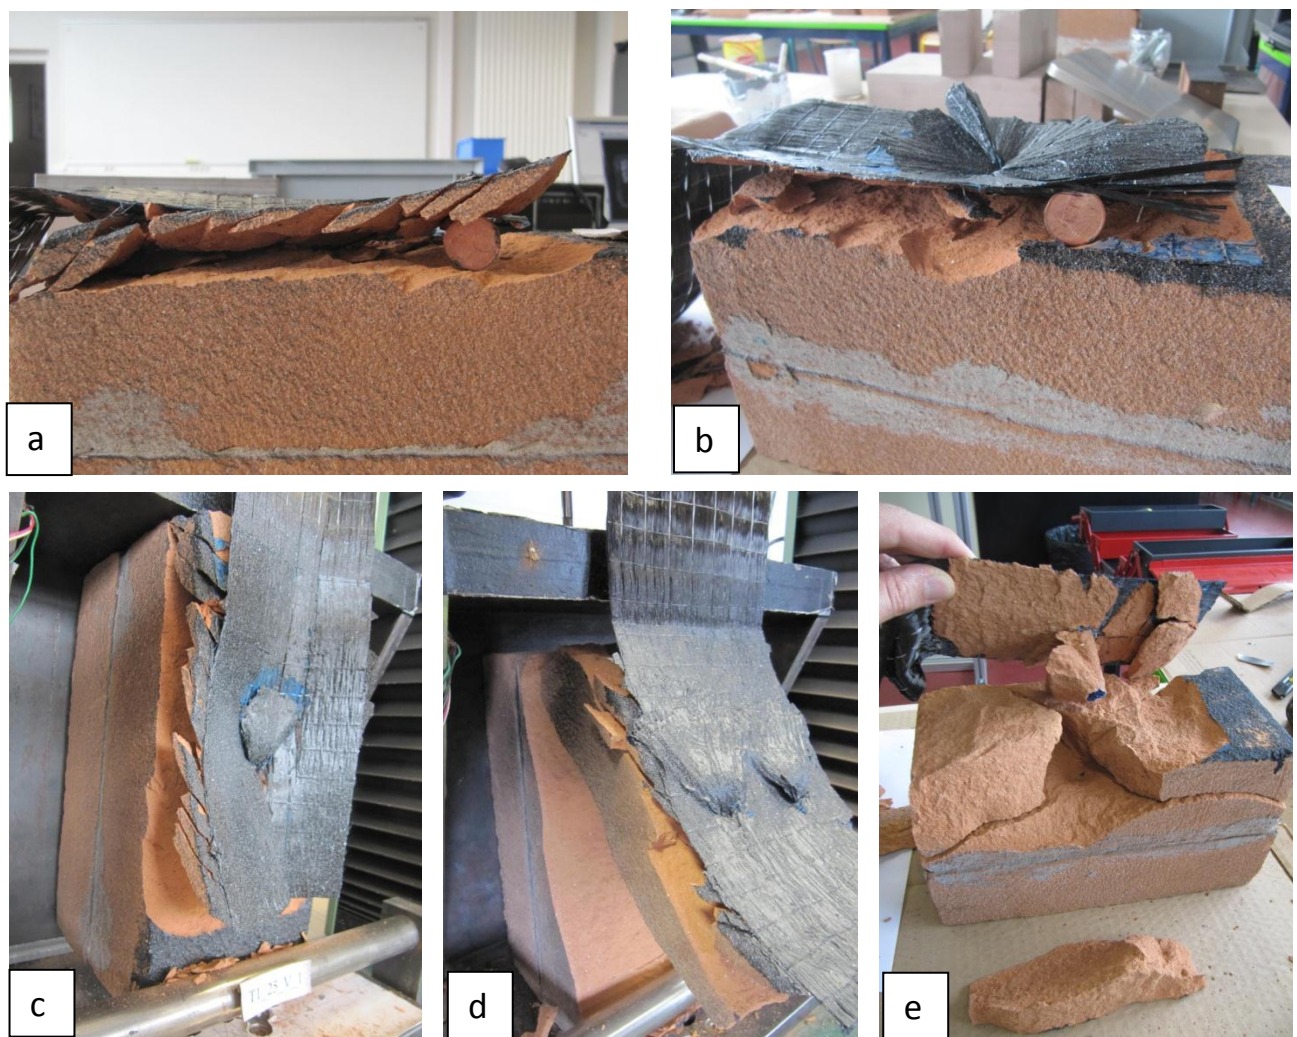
The failure modes; a) Cohesive Fracture (CF), b) Mixed fracture, c) Debonding splay anchor (DSA) allowed after a cohesive fracture, d) Prismatic Failure, e) Pull out nail (PON).
